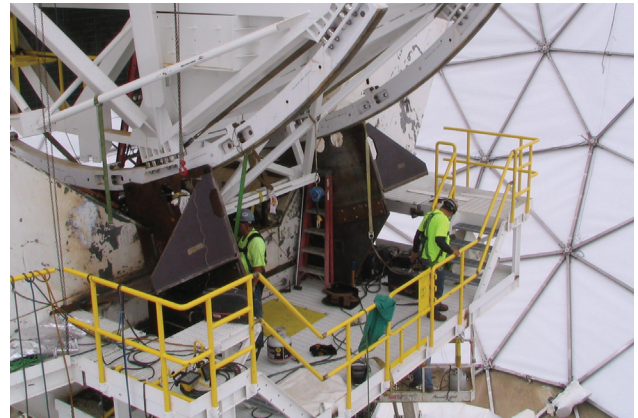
Workers install the 2-inch-thick steel plate assemblies that will become the new elevation drive mounting points. The elevation sector gears are just inboard of the mounts.
